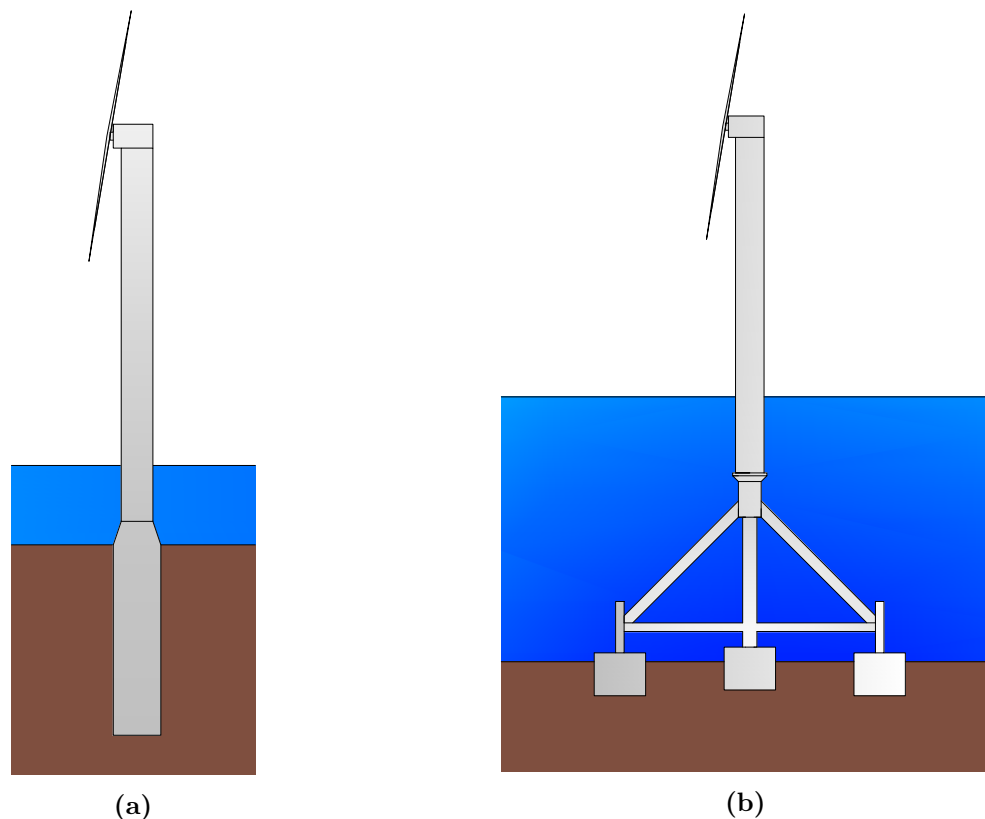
Foundations for OWT a) Mono foundation b) Tripod foundation
